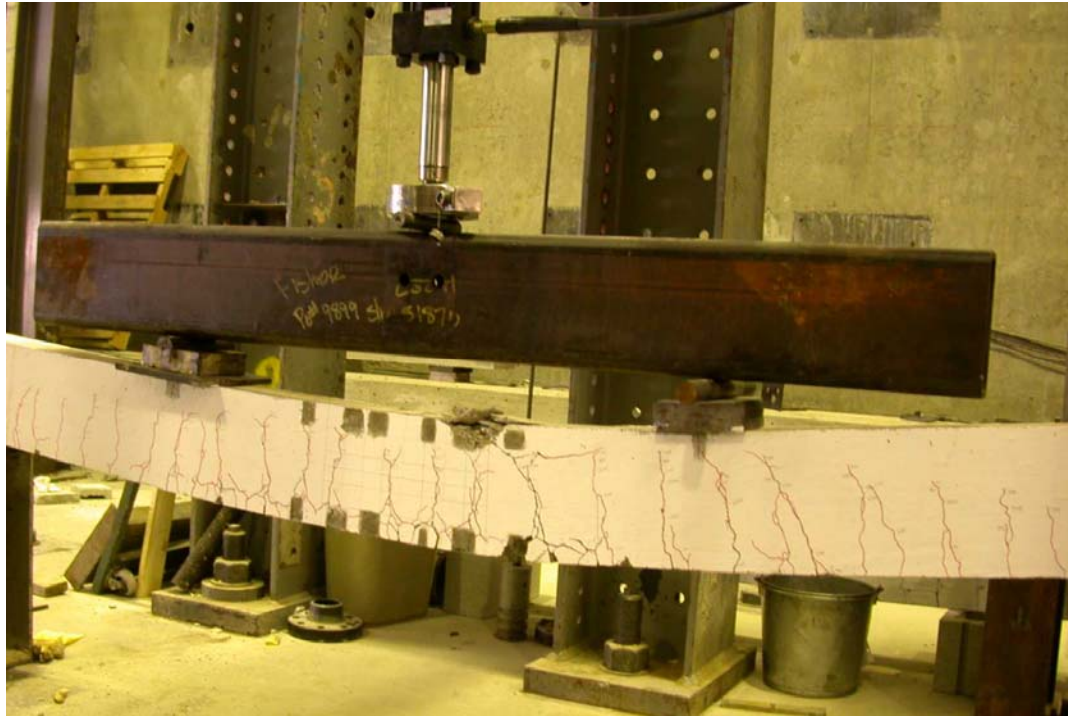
Final Cracking Pattern of Beam P-2 at Failure.
